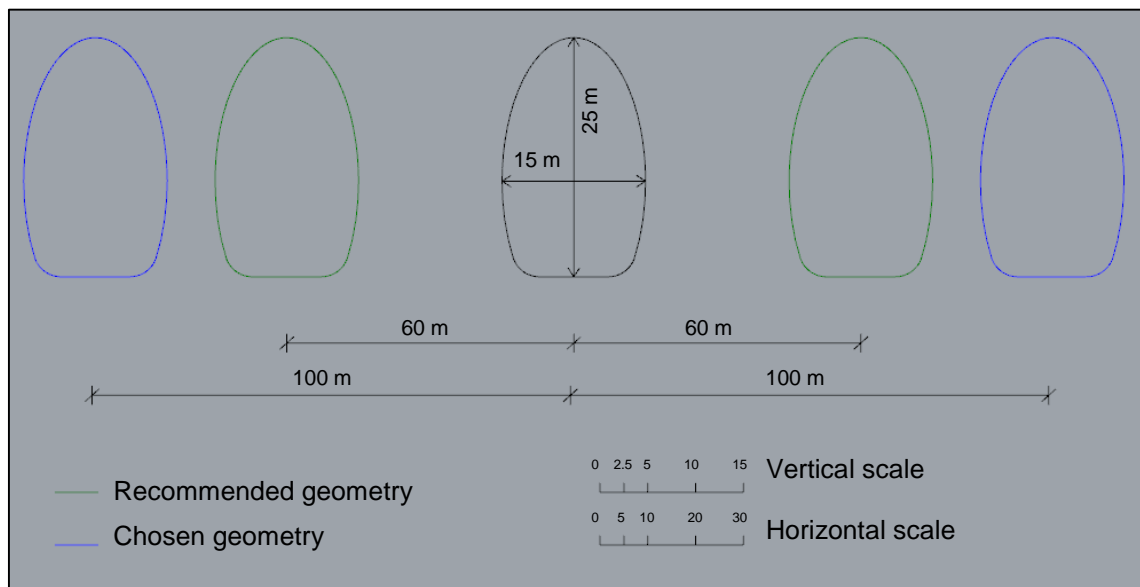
Cross section of the cavern system for the Underground Pumped Hydro Storage
